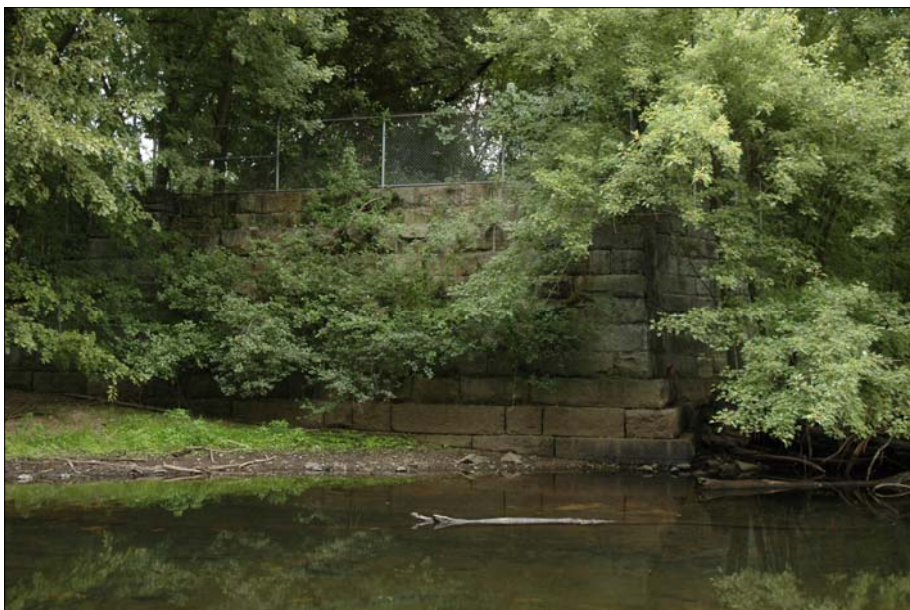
Resource 30, Assabet River Bridge, south abutment, looking south.
